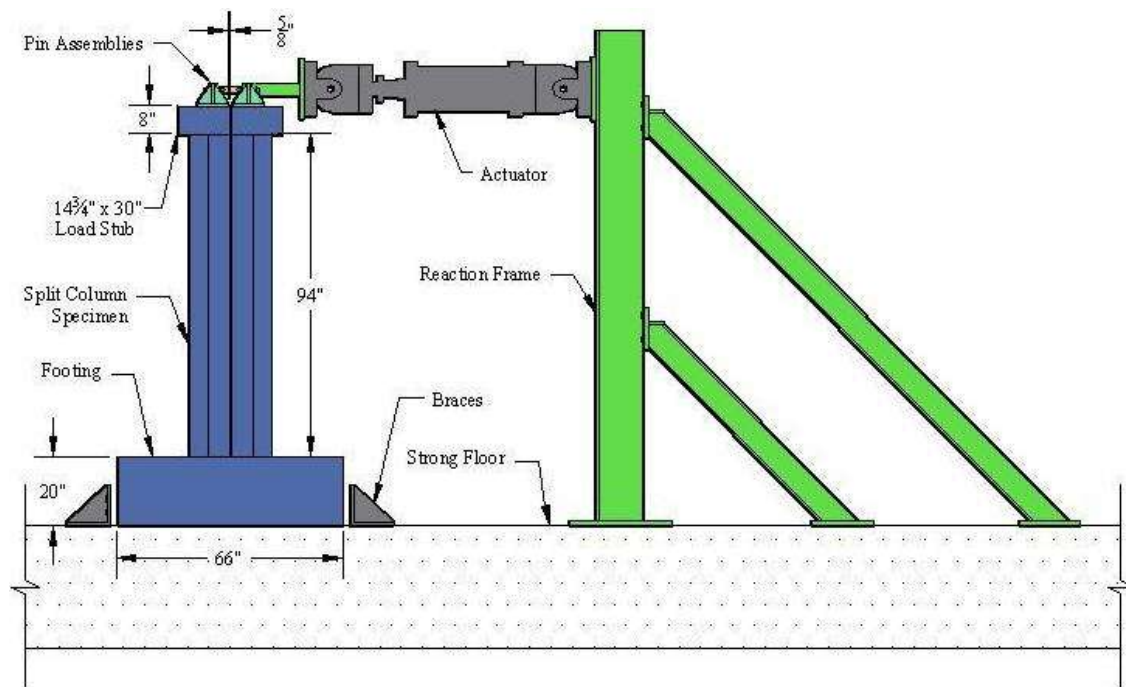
Test Setup for the Split Columns (1 in. = 25.4 mm)
